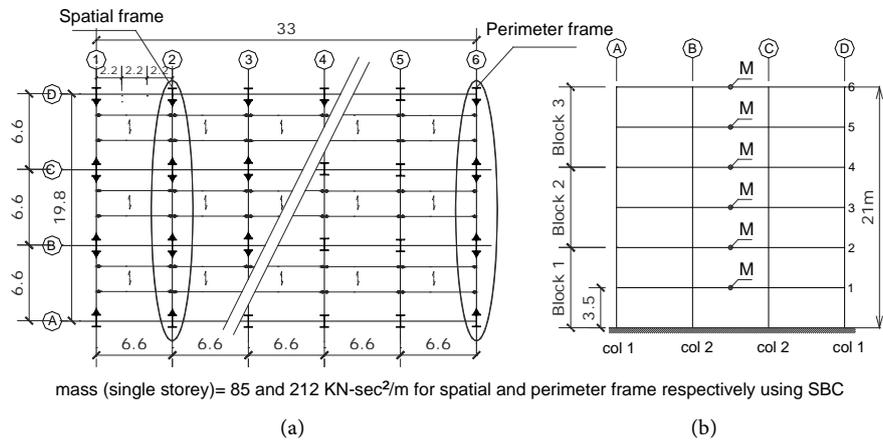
Typical floor plan of the building (a) and Frame elevation for 6 stories only (b).
